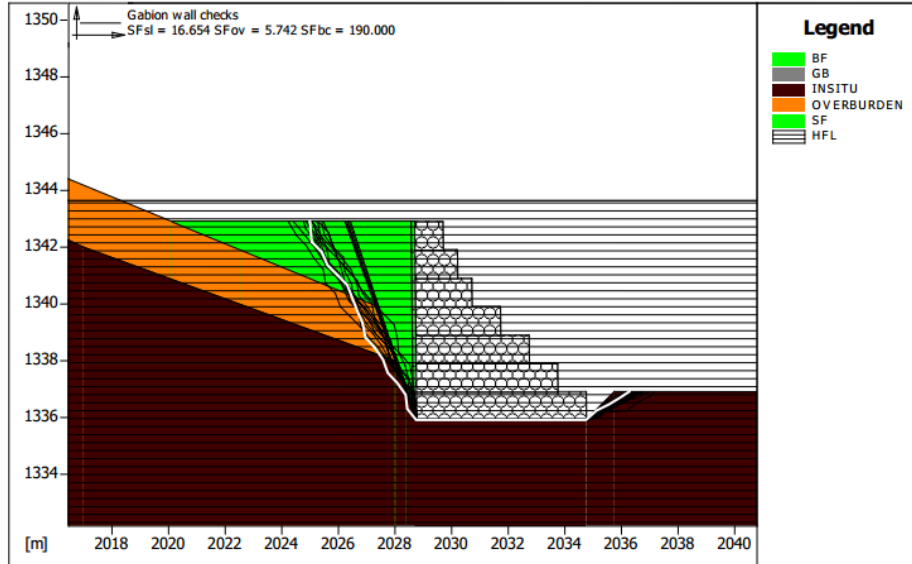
Slope stability analysis of 7m high gabion toe wall
